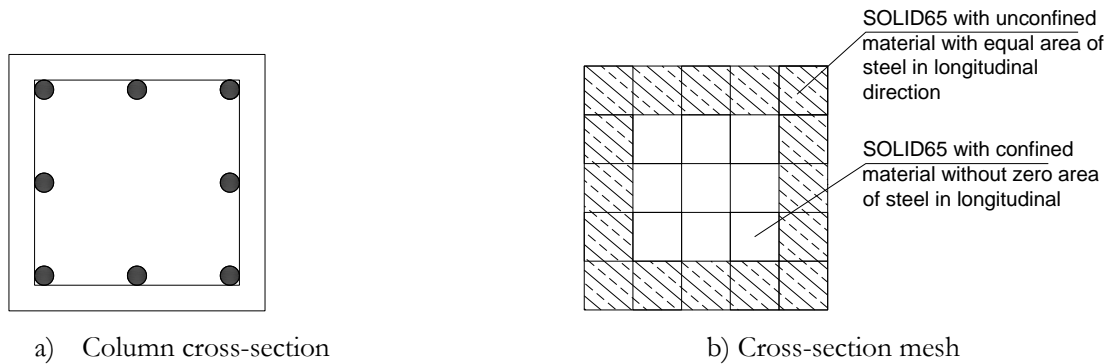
Description of the column cross-section considered in the proposed modelling approach
